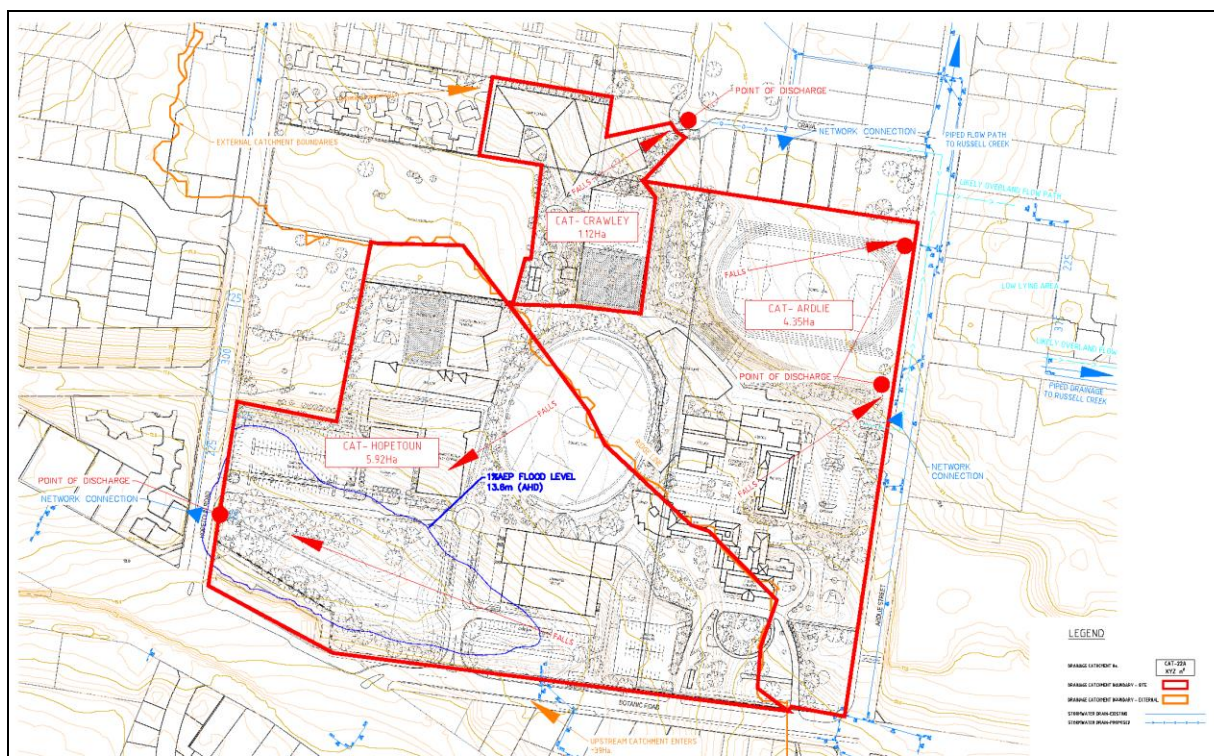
Site Locality and Catchment Plan (refer plan SWS-01)
